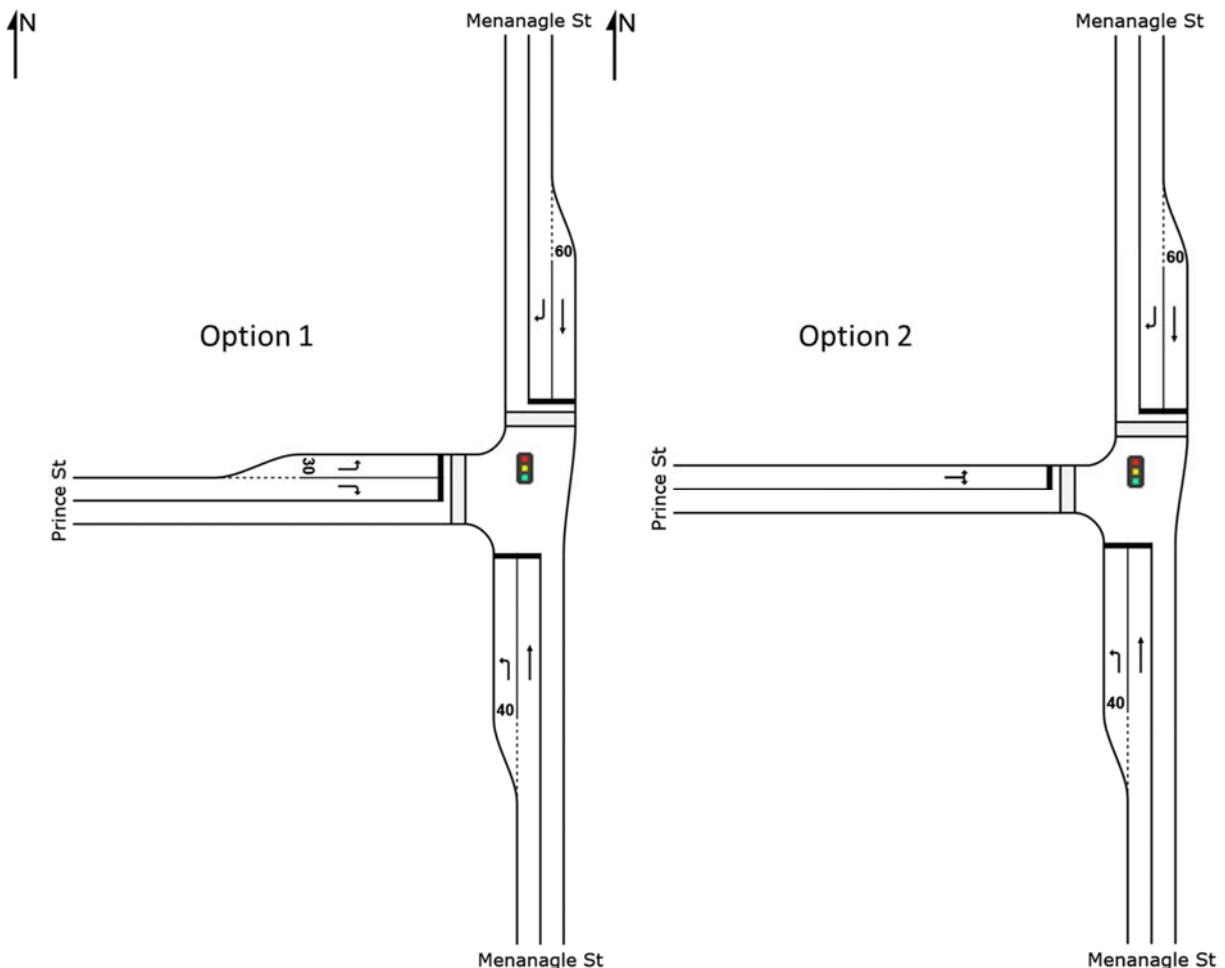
Prince Street / Menangle Street Proposed Signal Control Plan
